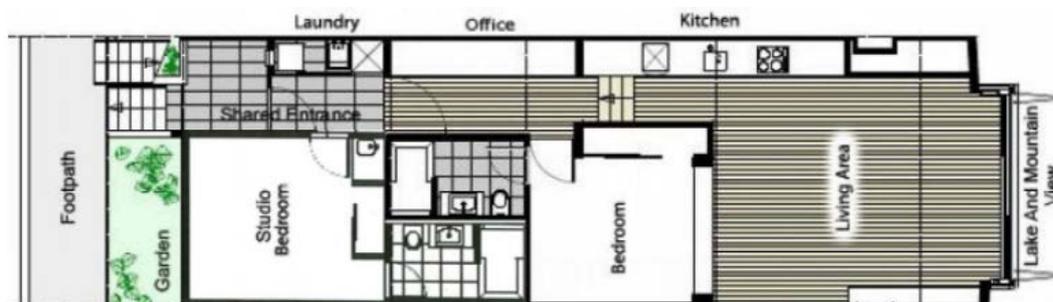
Pounamu apartments layout (Source: [www.pounamuapartments.co.nz](http://www.pounamuapartments.co.nz))
